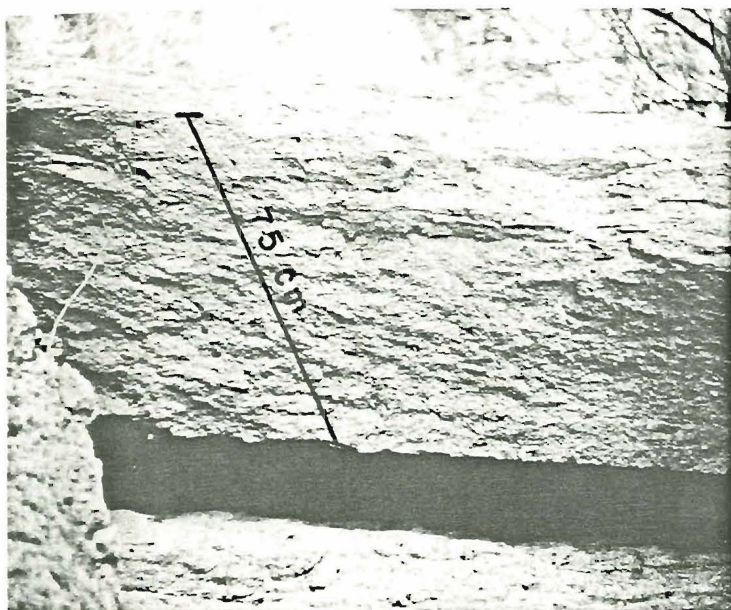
Slab failure at roadcut near Missouri River.
